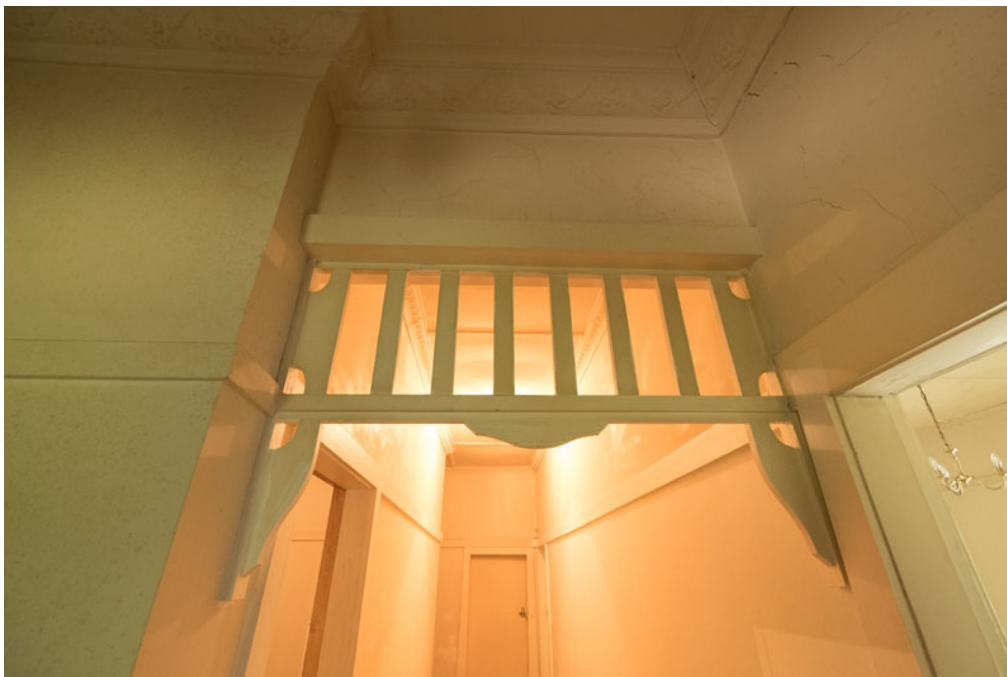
Timber screen in hallway. Note the step in the ceiling alignment so that the screen could fit next to the living room door. There has been no attention to detailed internal arrangement during construction, with doors oddly placed, off-centre and not contained within spaces such as the entry hall.
